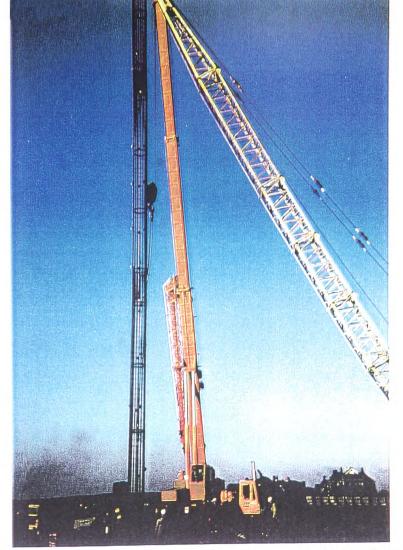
Lowering the full length of the reinforcement cage into the hole in order to avoid damage to the instrumentation and electrical connections
